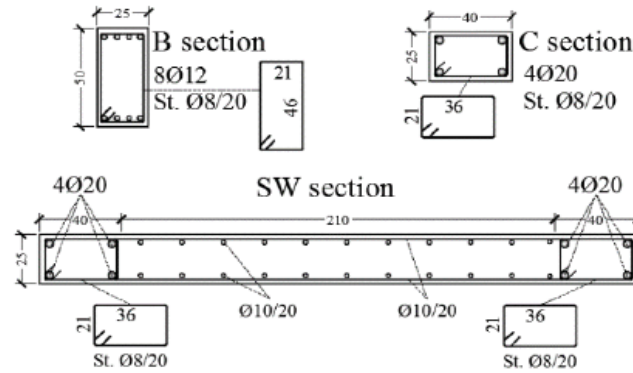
Reinforcement details of the (B)eam section, (C)olumn section and (SW) Shear Wall section respectively [9].
